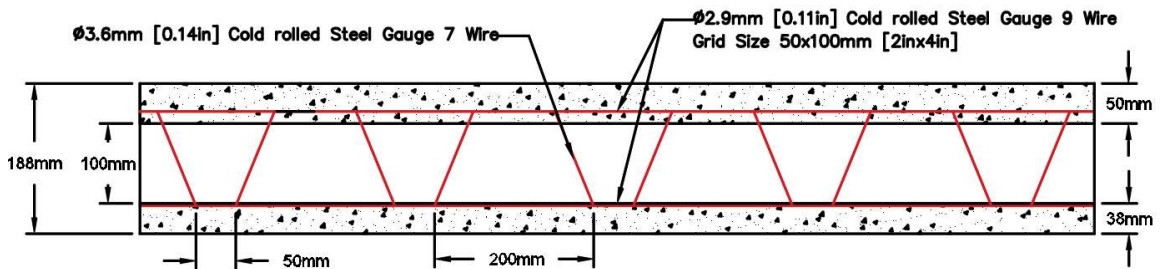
Dimension and Cold Rolled Steel Reinforcement used for Optimized-CSP
